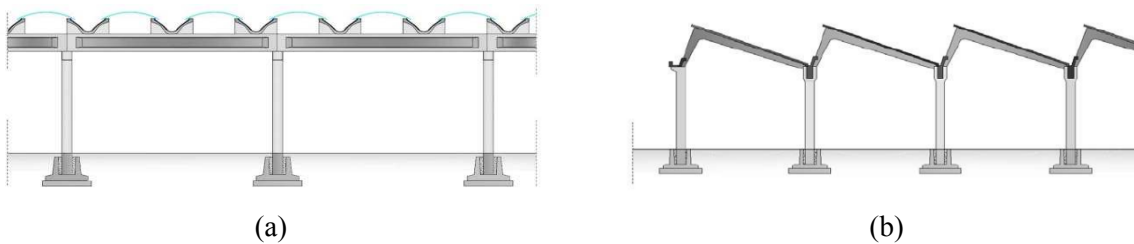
(a) Discontinuous plane roof and (b) shed roof (Bonfanti et al. 2008).
